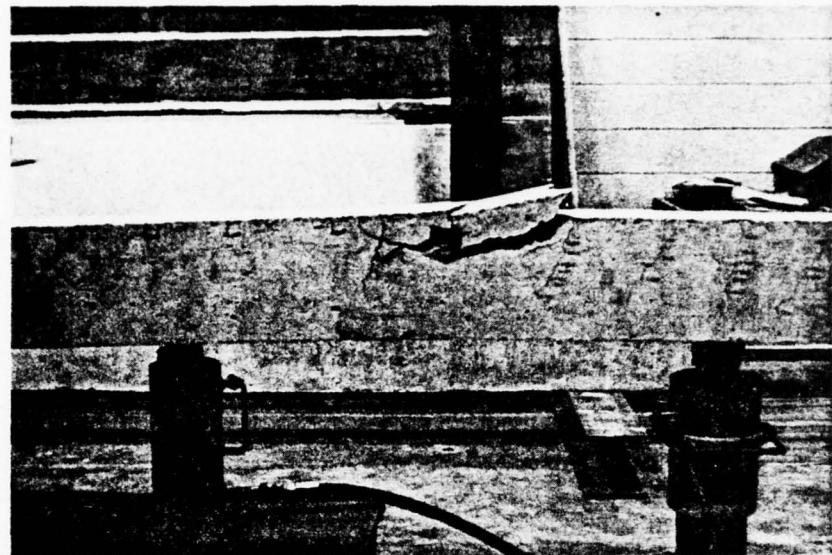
Side Split Failure of T-1-C. Splice Length = 12 inches. Failure Moment = 12.75 kip-ft.
